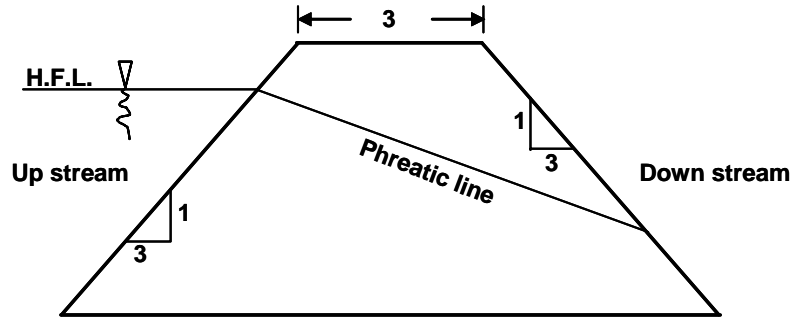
Section of embankment showing phreatic line meeting down downstream face causing instability
